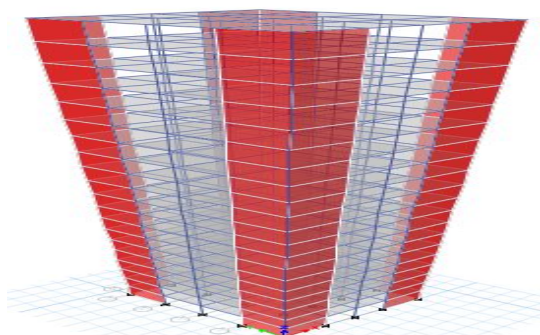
10 FLOOR BUILDING WITH SHEAR WALL
